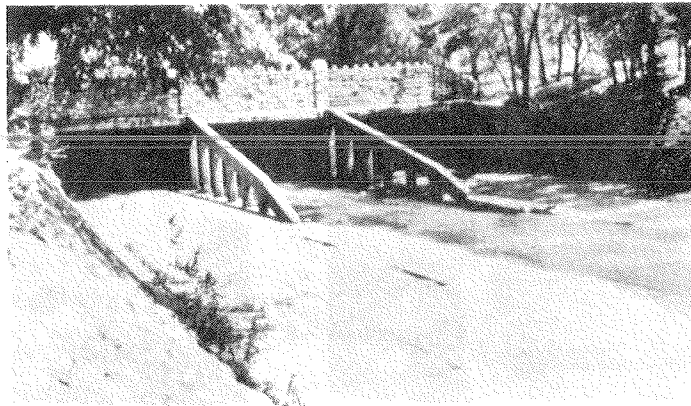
Concrete debris fins with sloping leading edges as extensions of culvert walls.
